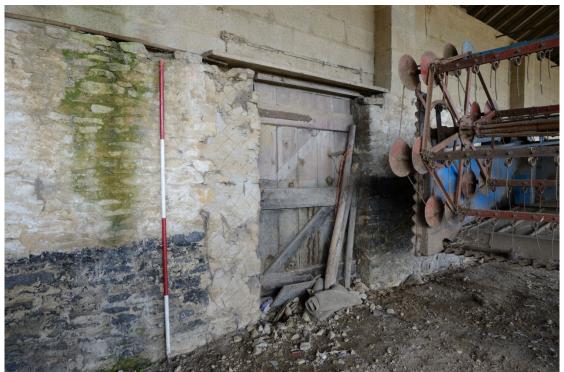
Door in the west wall of Building 6C, looking west-northwest
